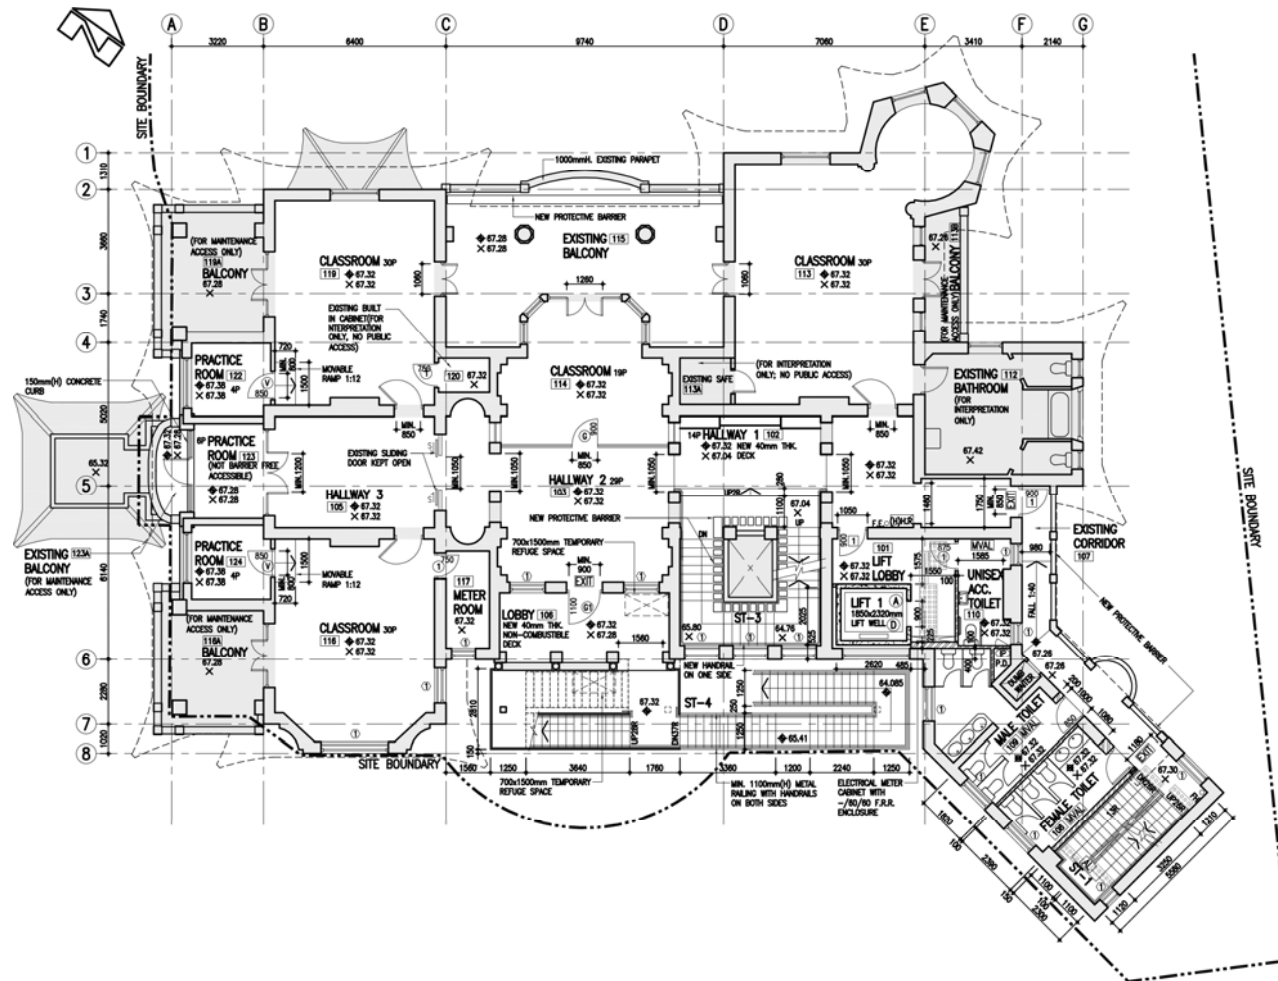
Proposed First Floor Plan of the Mansion (not to scale)
